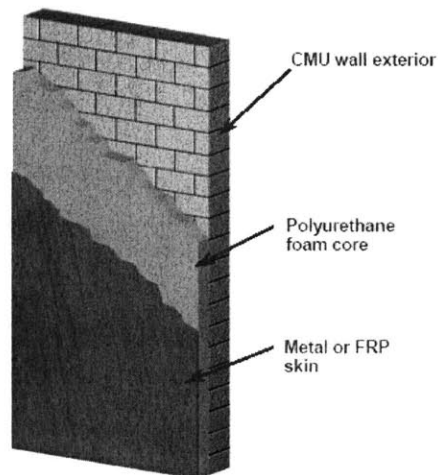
Bearing Wall Retrofit Scheme (Crawford)
